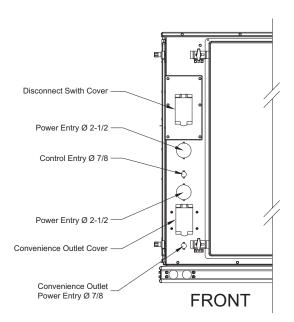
J06 thru 12ZJ Unit Electrical Entry
